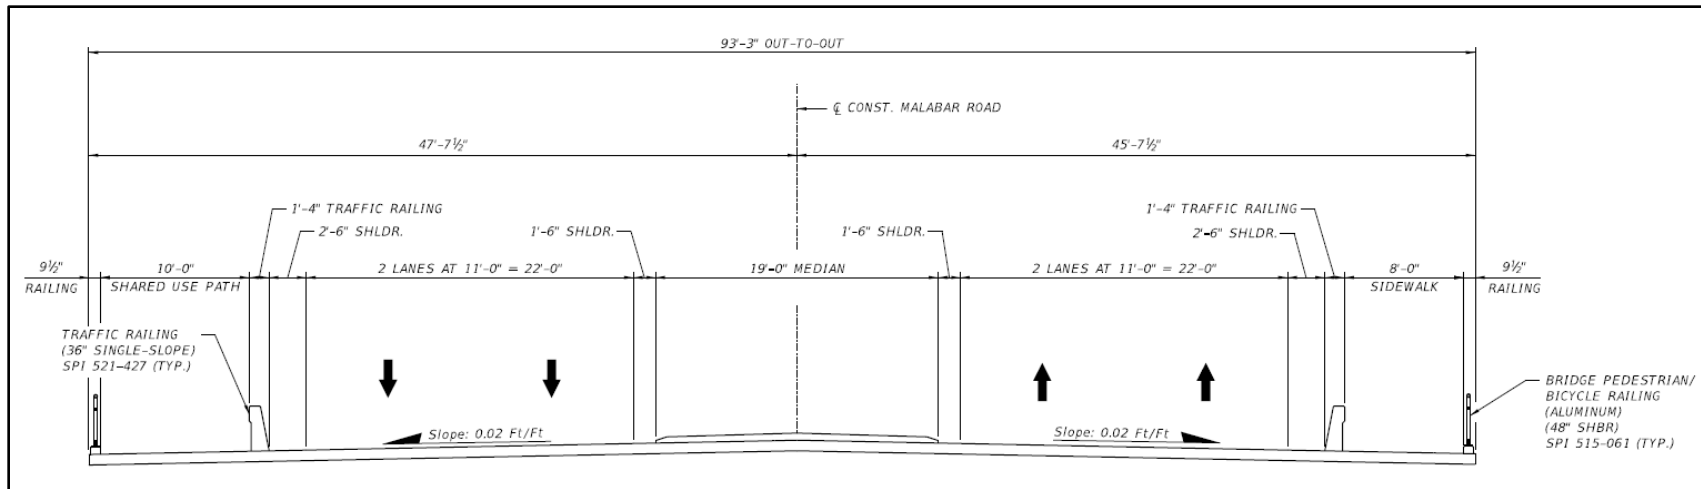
Preferred Alternative Typical Section – Bridge over Canal C-10
